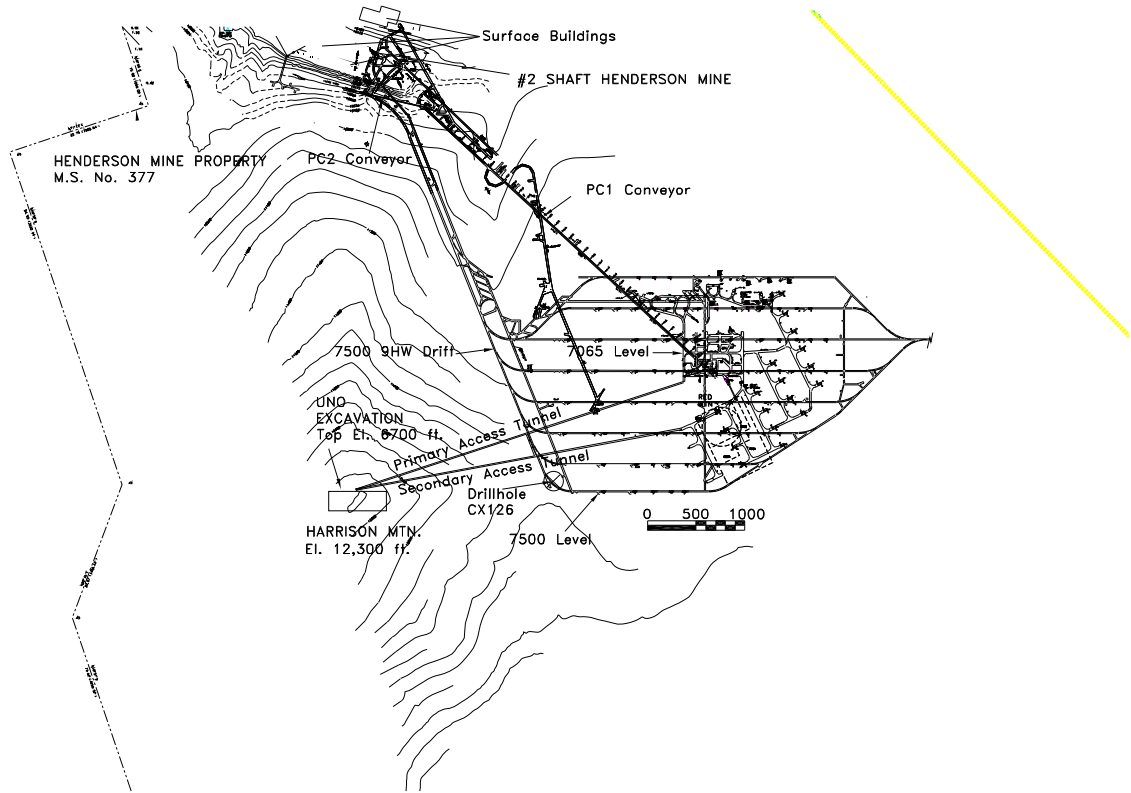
Plan view of Henderson Mine workings and proposed UNO location.
